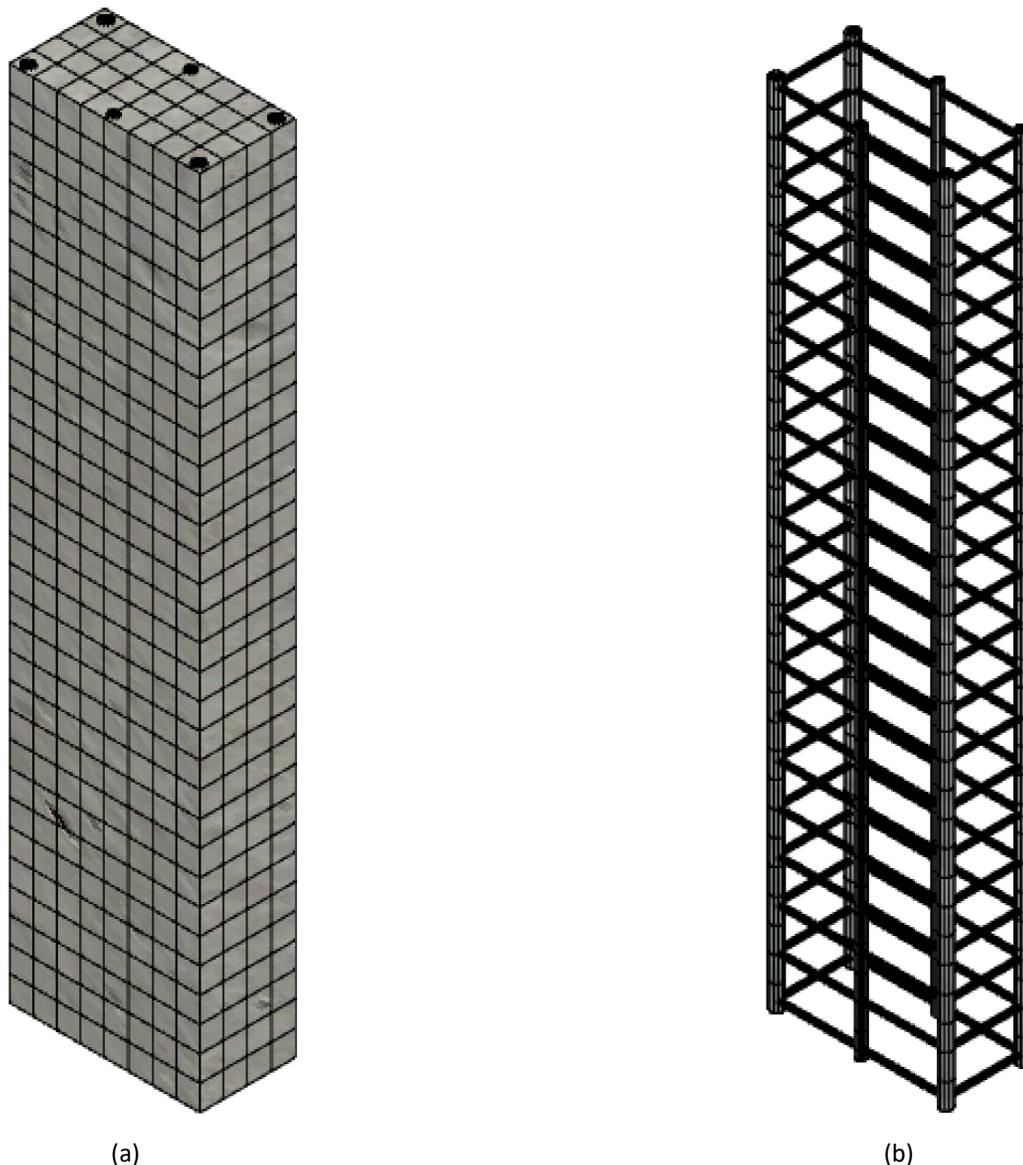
(a) 3D model for column, (b) 3D model for the column reinforcement
